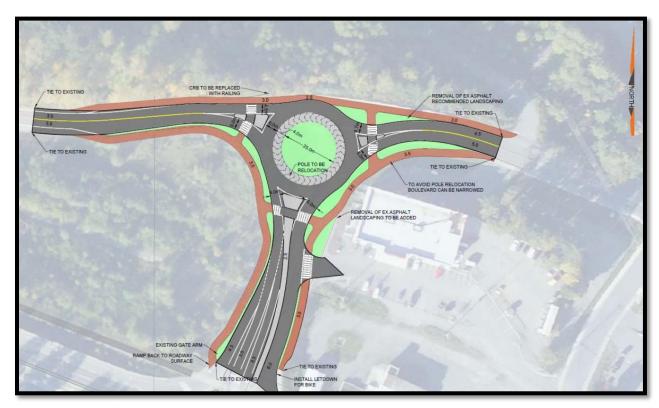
Ludlow/Rocky Creek Road Roundabout Design
